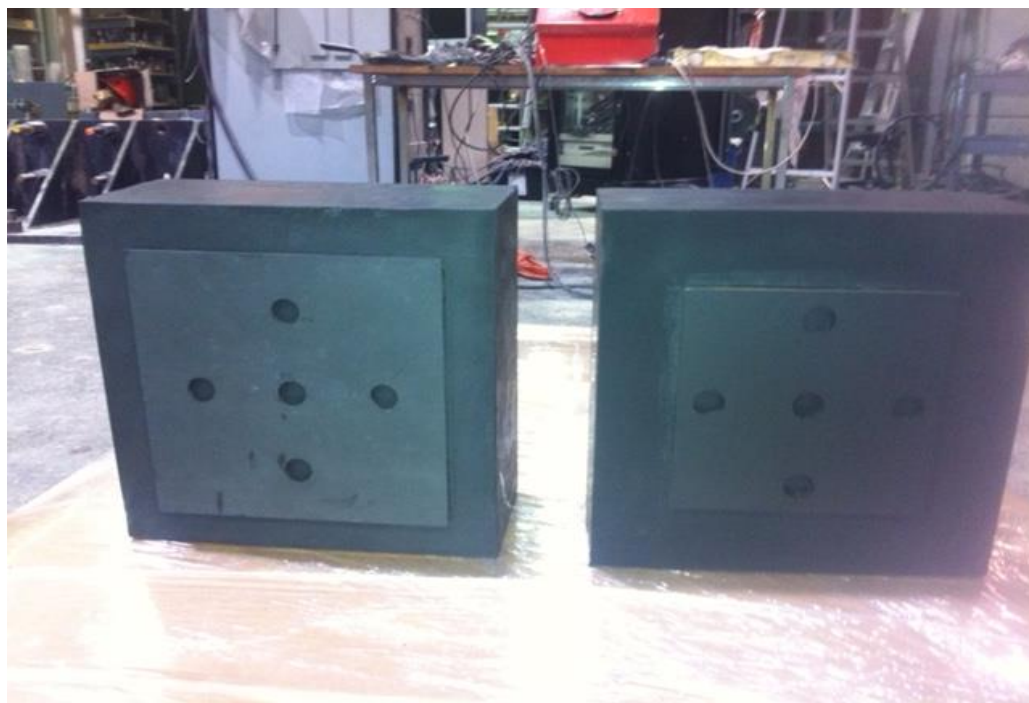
Fabricated SB-CFREI with top and bottom Steel cover plates
